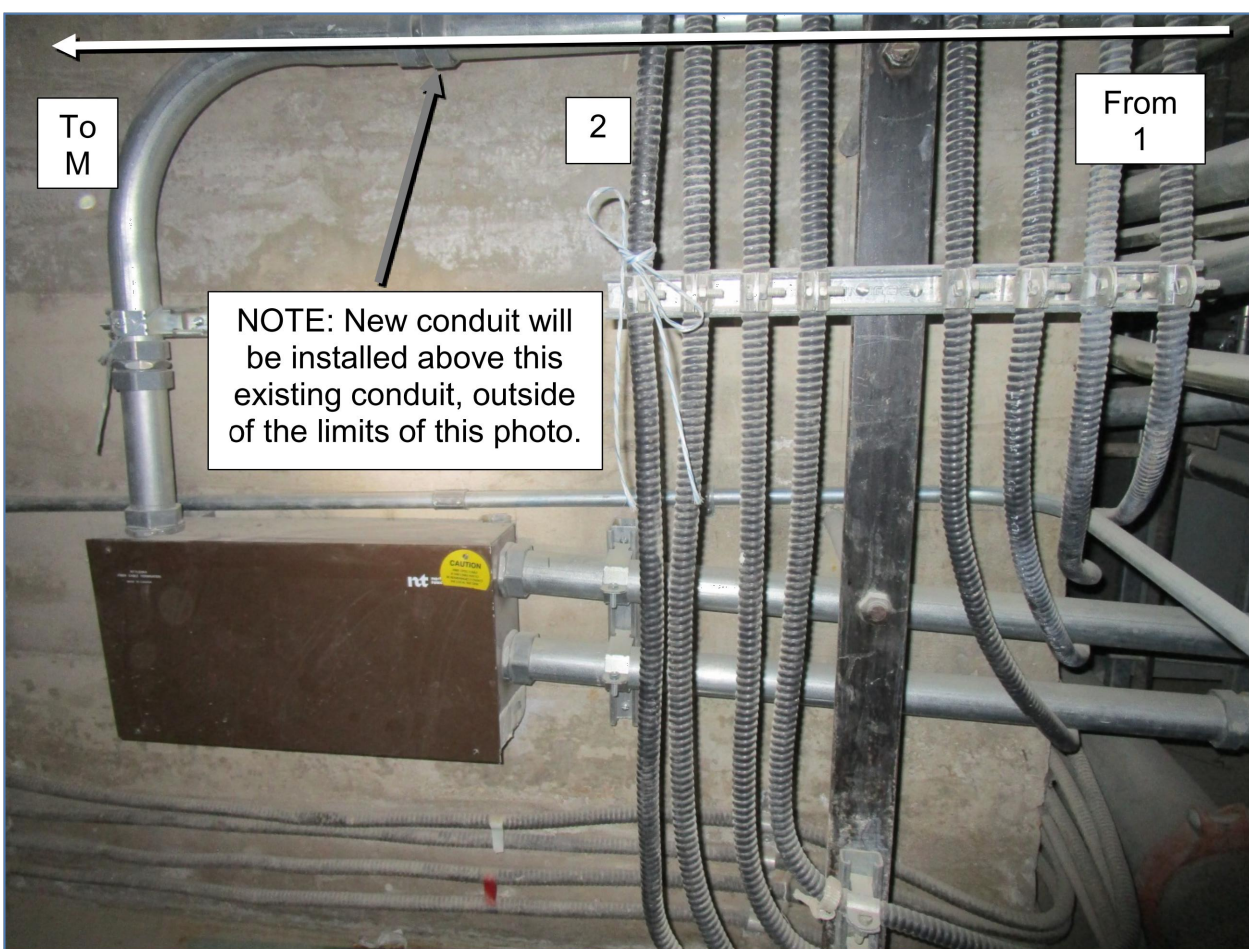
Location L, conduit crossing wall in tunnel under dome (View 3)
